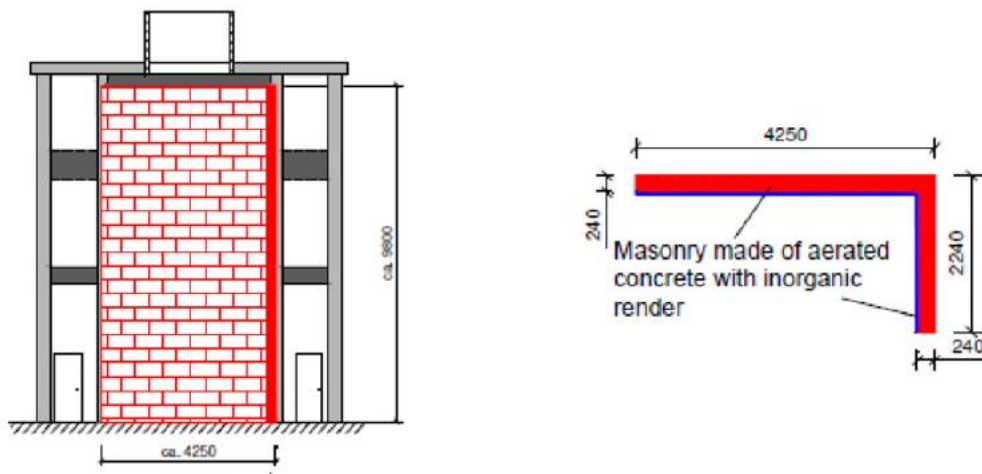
Front view and plan view of 200 kg crib EIFS façade test substrate<sup>[167]</sup>.
